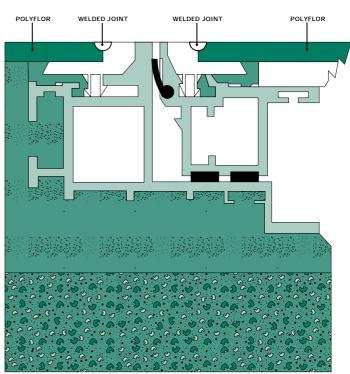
Fixing detail of the Howe Green Visedge single access cover
